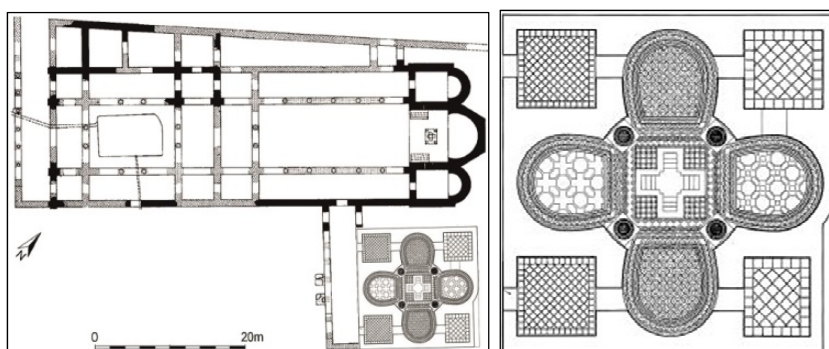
Caričin grad, plan of the Episcopal Basilica (left) and plan of the baptistery (right) [3].
